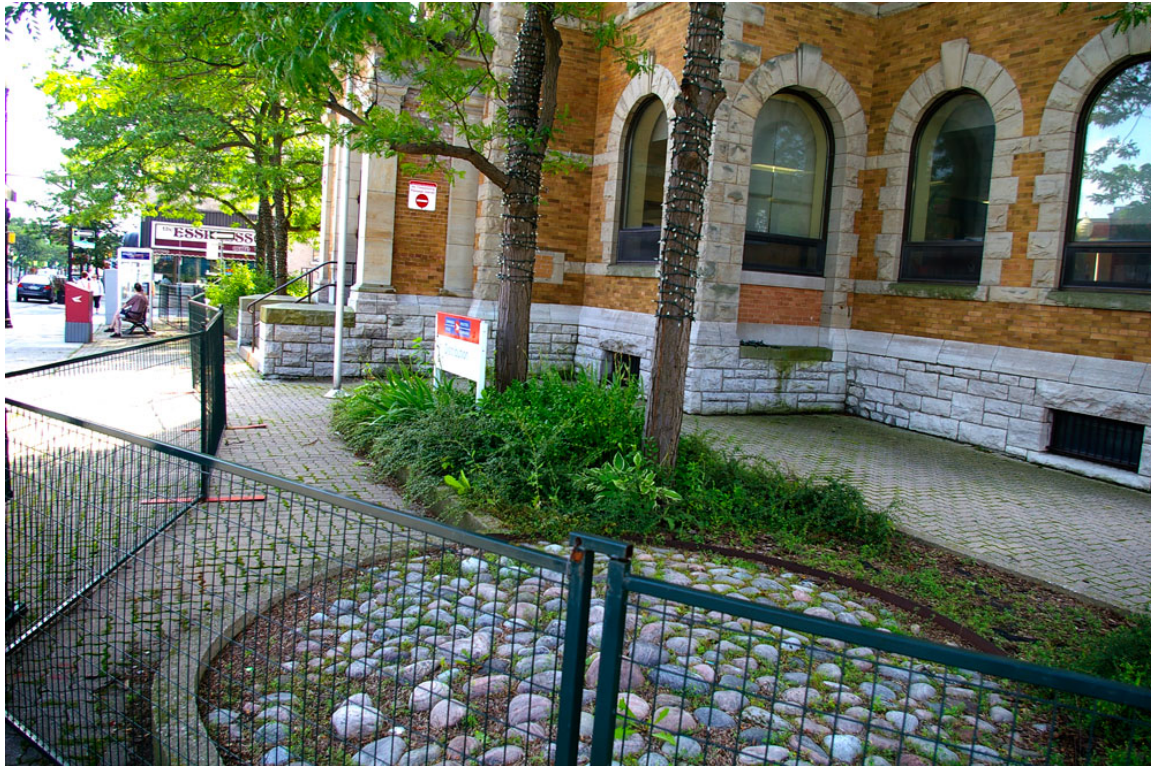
View of the front landscaping looking east from outside the temporary fencing near the north-west corner of the CPC property. The interlocking concrete pavers were laid and the raised rectangular and circular concrete planters installed in 1979, as indicated (but not very clearly) on the 1978 ground floor plan (A2: [Figure 46](#); [Figure 47](#)). The rectangular bed was planted with perennial shrubs and ground cover and three locust trees. The circular bed, likely originally planted with flowering annuals, is now filled with low-maintenance rounded stones and gravel.
